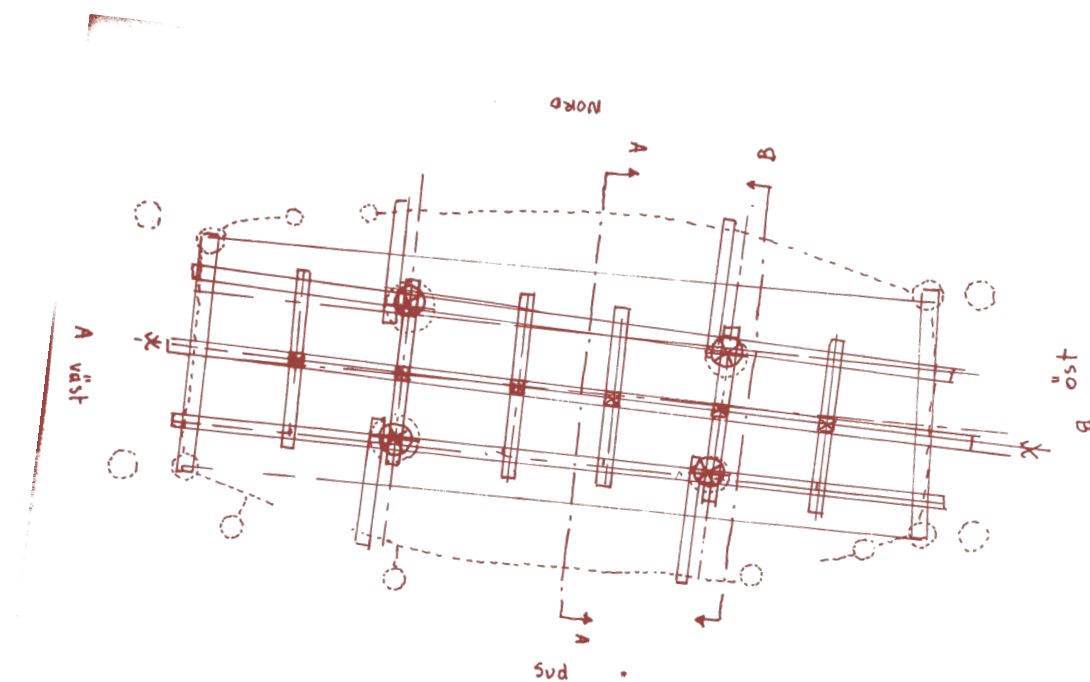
Architectural ceiling plan of the temple, by Louis Lecareux, Used with permission
